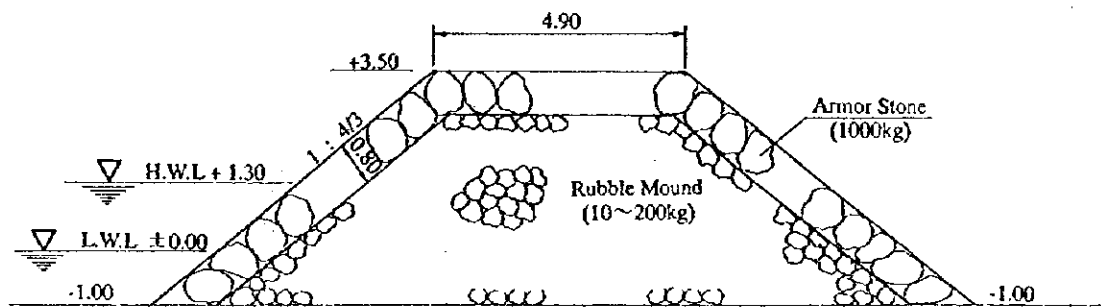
Typical Cross Section of Groin (Rubble Mound with Armor Stone)
